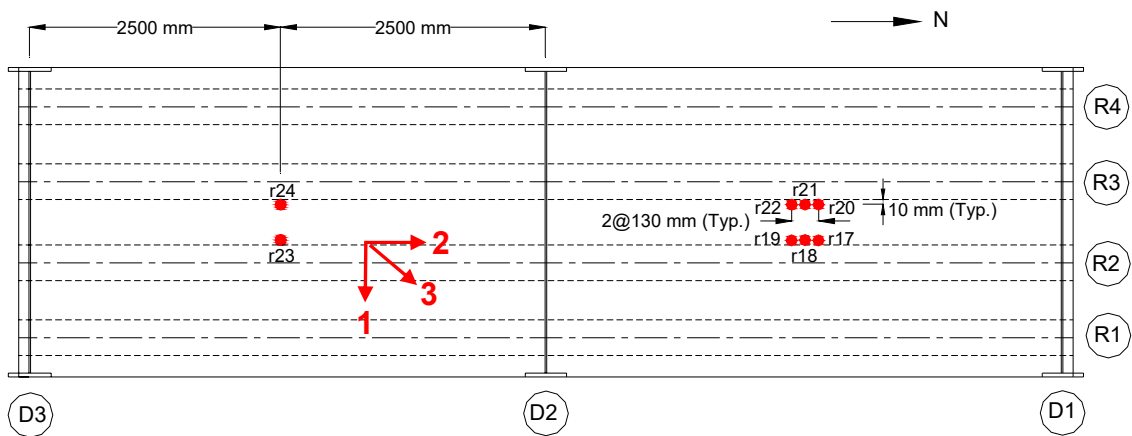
Specimen 4: Strain Gage Rosettes in Bottom of Deck Plate near Rib-to-Deck Welds
